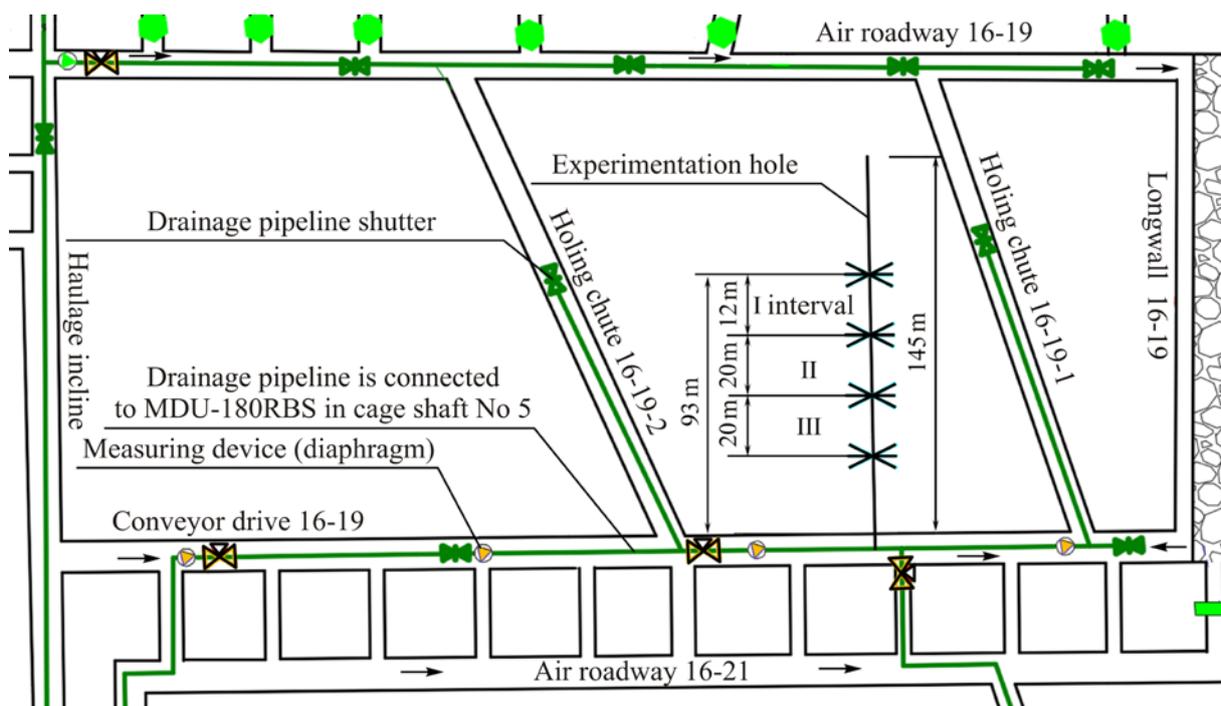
Experimental hole for multistage hydraulic fracturing: Layout.
